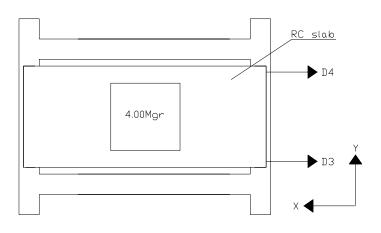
Instrumentation set-up: 2nd Level - Plan view.
